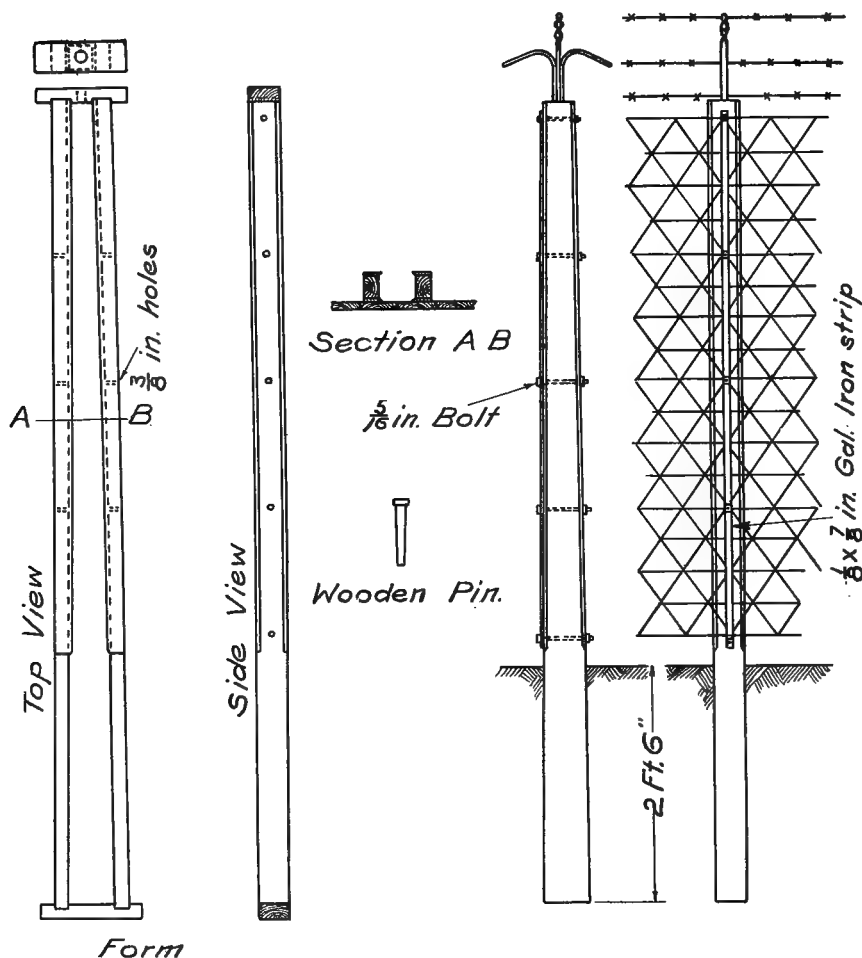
DETAILS OF CONSTRUCTION, DELLWOOD PARK FENCE POSTS.
